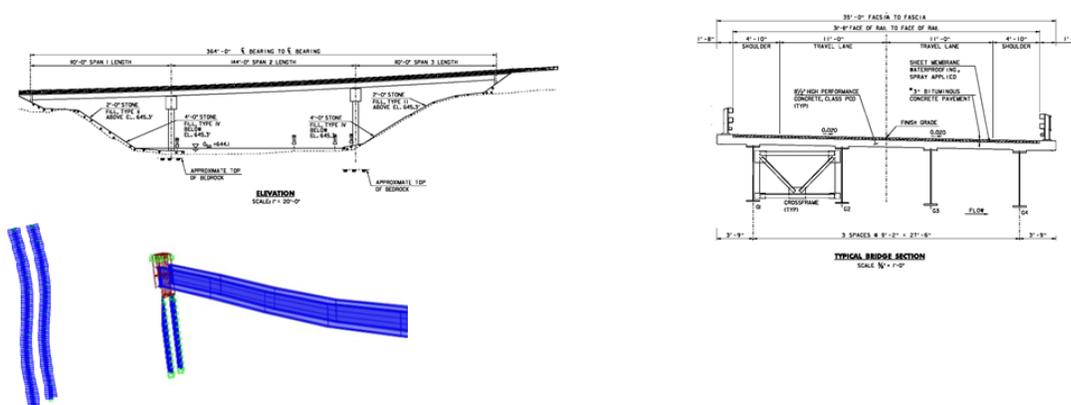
Sample Bridge (Bridge #38 Bethel Vermont)
